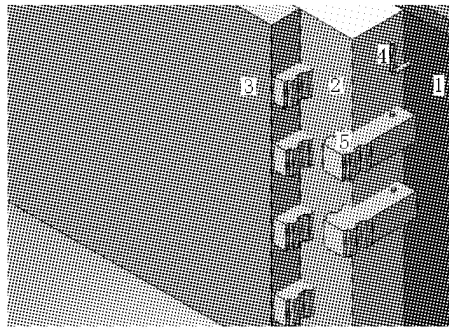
Double layer structure of fire-resistant Anti-wear layer anchor brick on side wall
